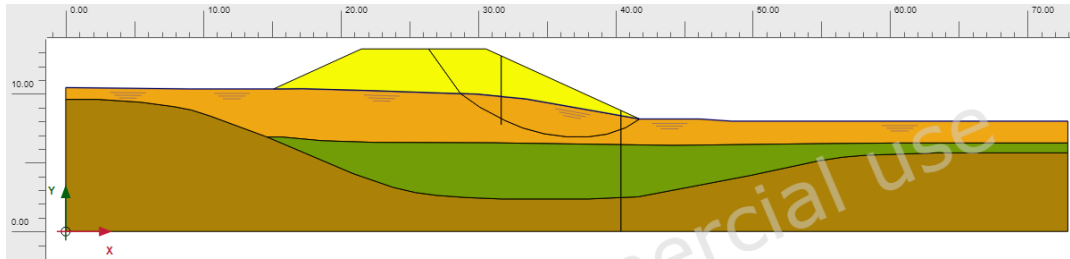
Initial cross-section used in linear elastic modeling of Metoki Road Embankment
